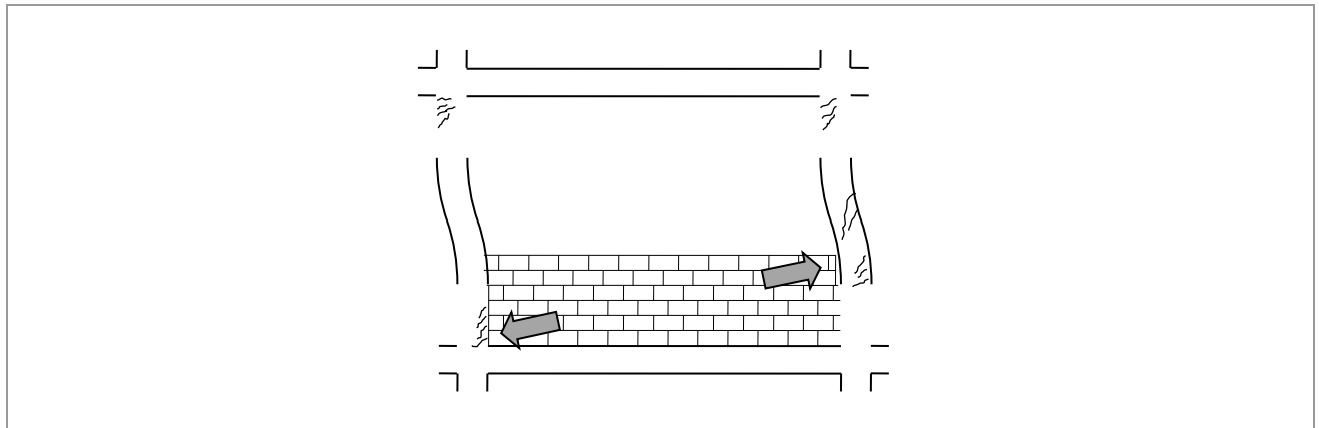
Additional load on the frame due to partial infill (according to [54])
